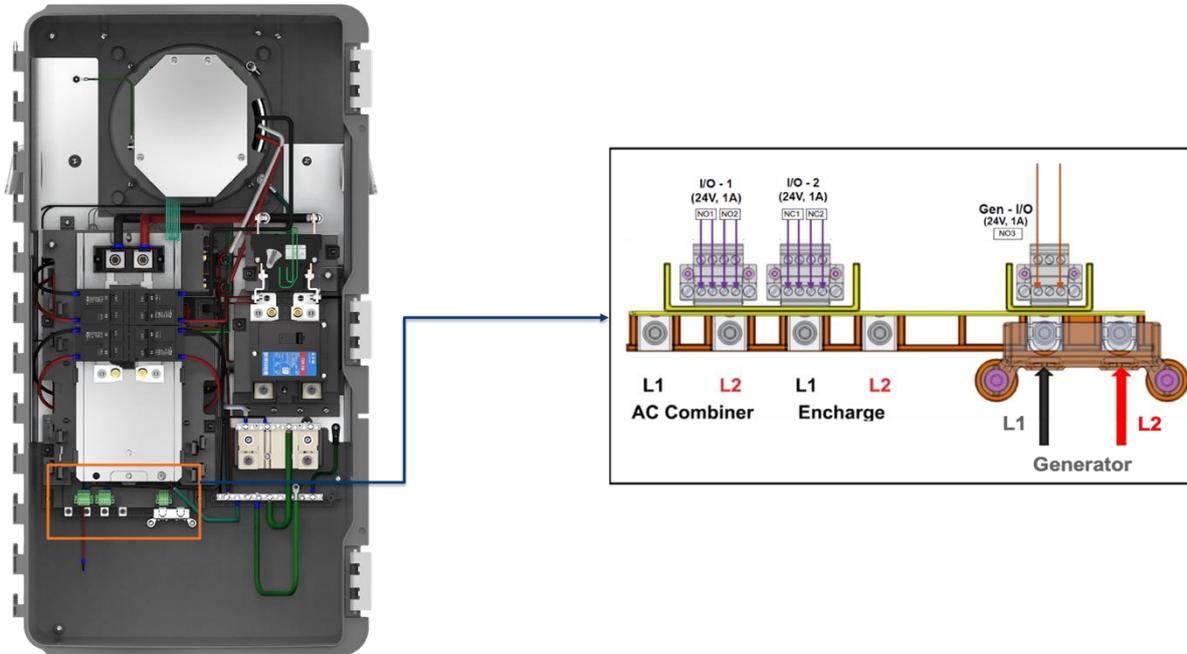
Enlarged view of generator lugs and auxiliary contact.
